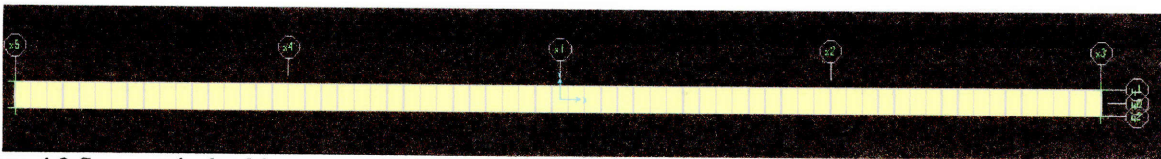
Symmetrical cable-stayed bridge about the x (longitudinal) axis of the horizontal plane
